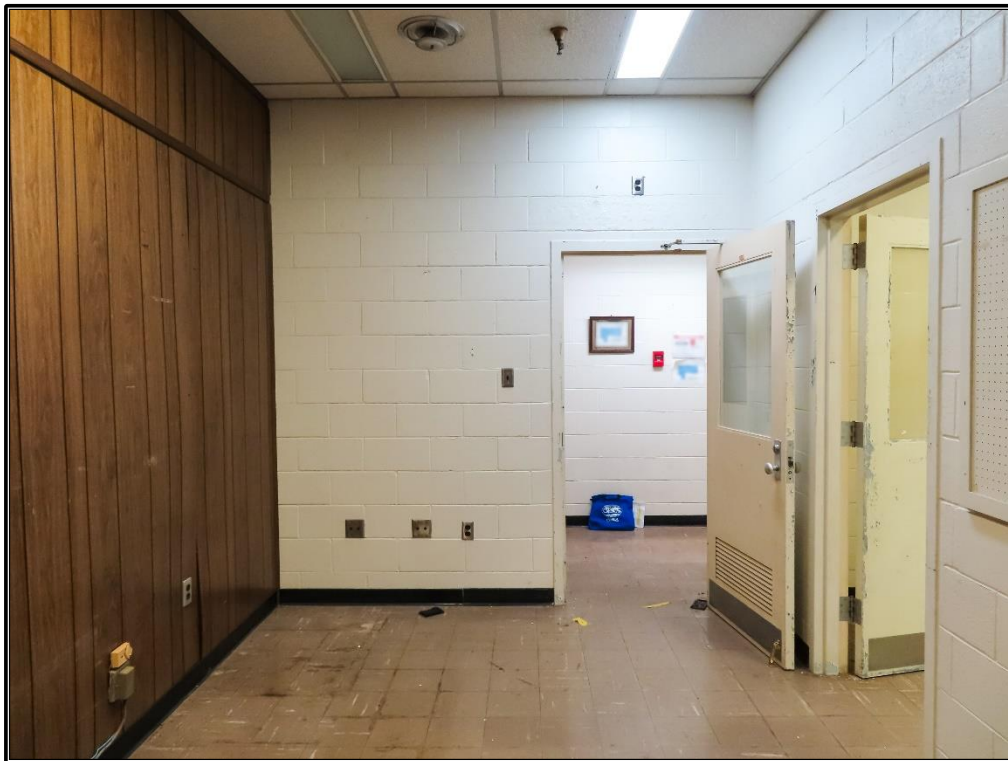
Offices in the northeast corner of Building 7710, looking southeast.
